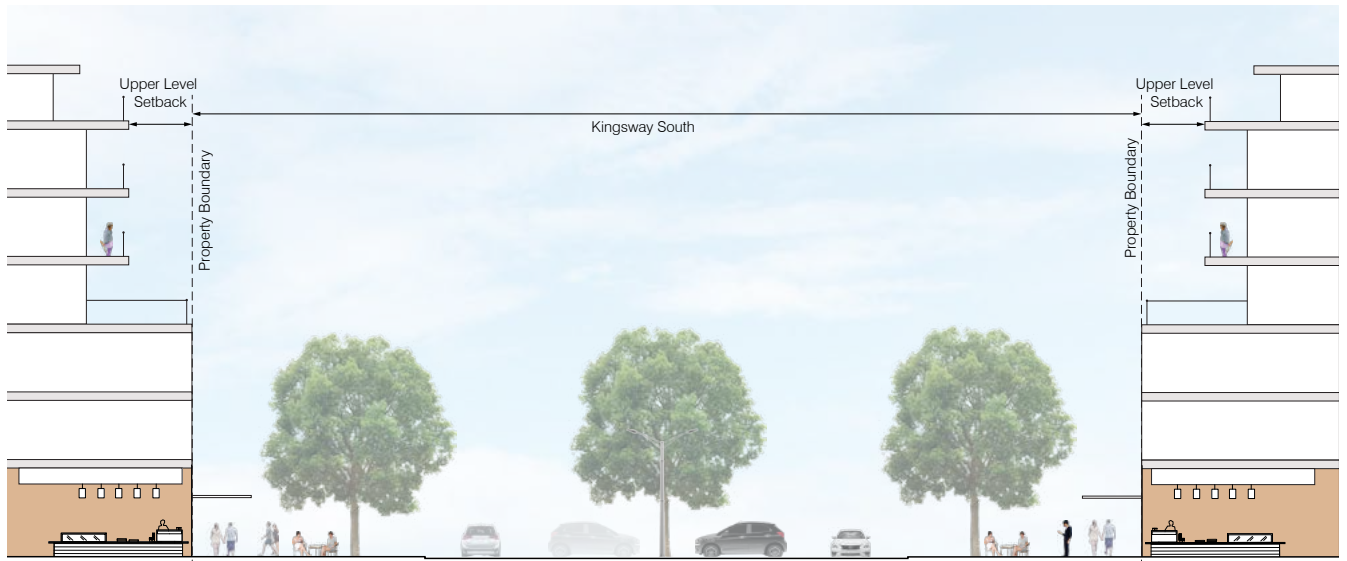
Section B - Illustration of potential typical section of Kingsway south of Coleman parade
